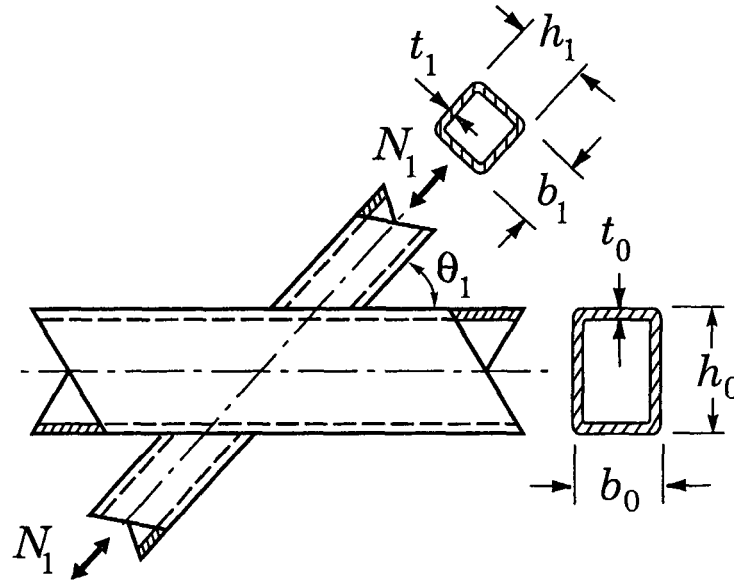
Description of the intersecting joint of rectangular steel hollow sections (Packer and Hendersen, 1997)
